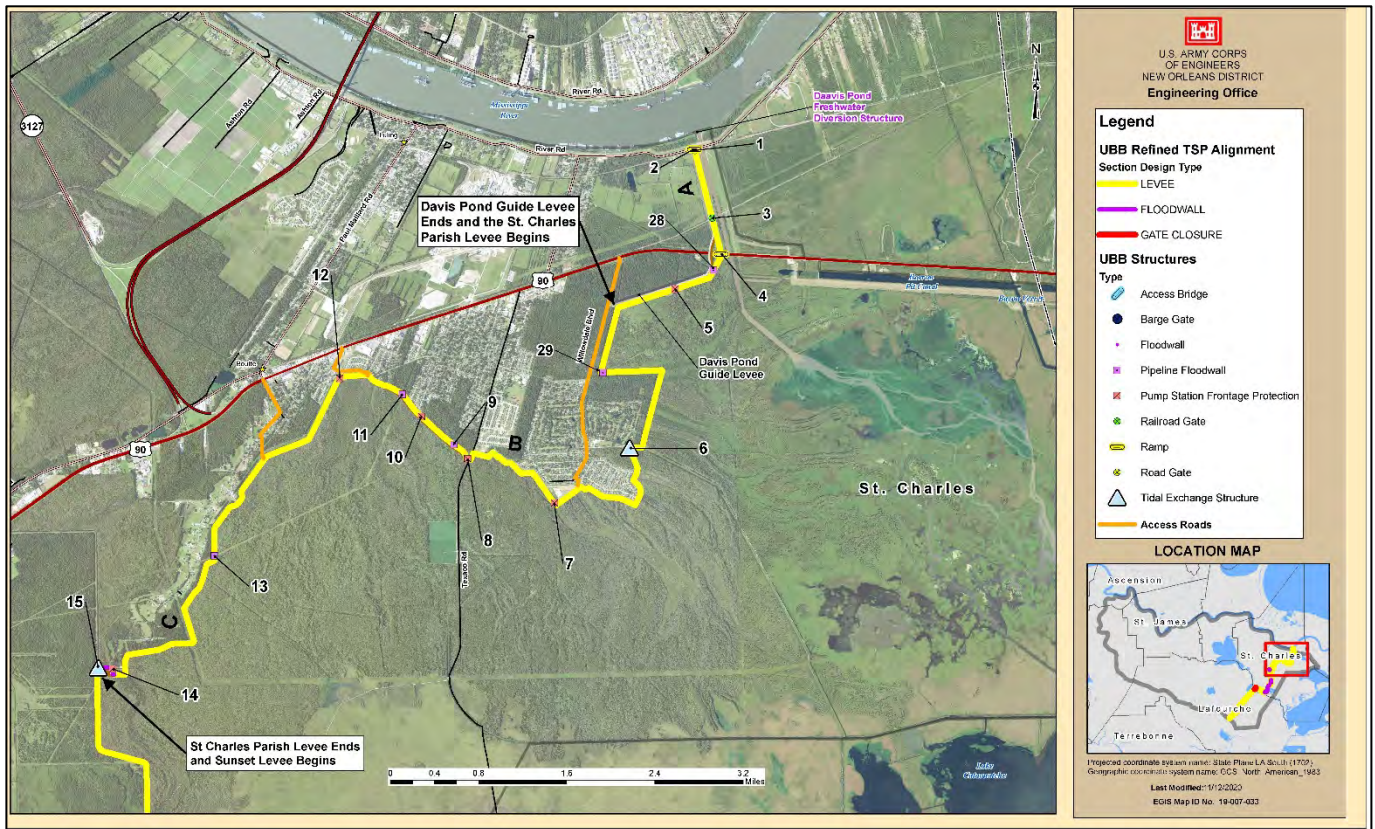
Overview of Recommended Plan (RP) – Hydraulic Reaches A through C (Northern)
